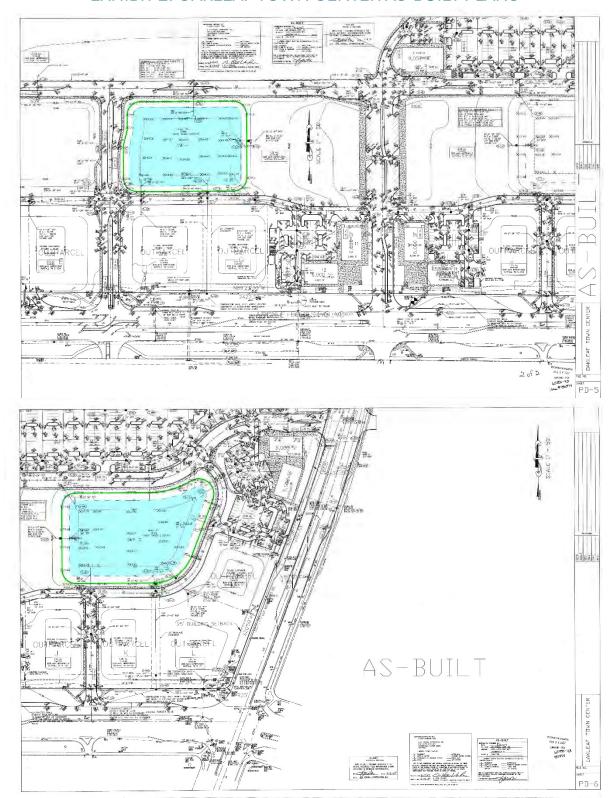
OAKLEAF TOWN CENTER AS-BUILT PLANS
